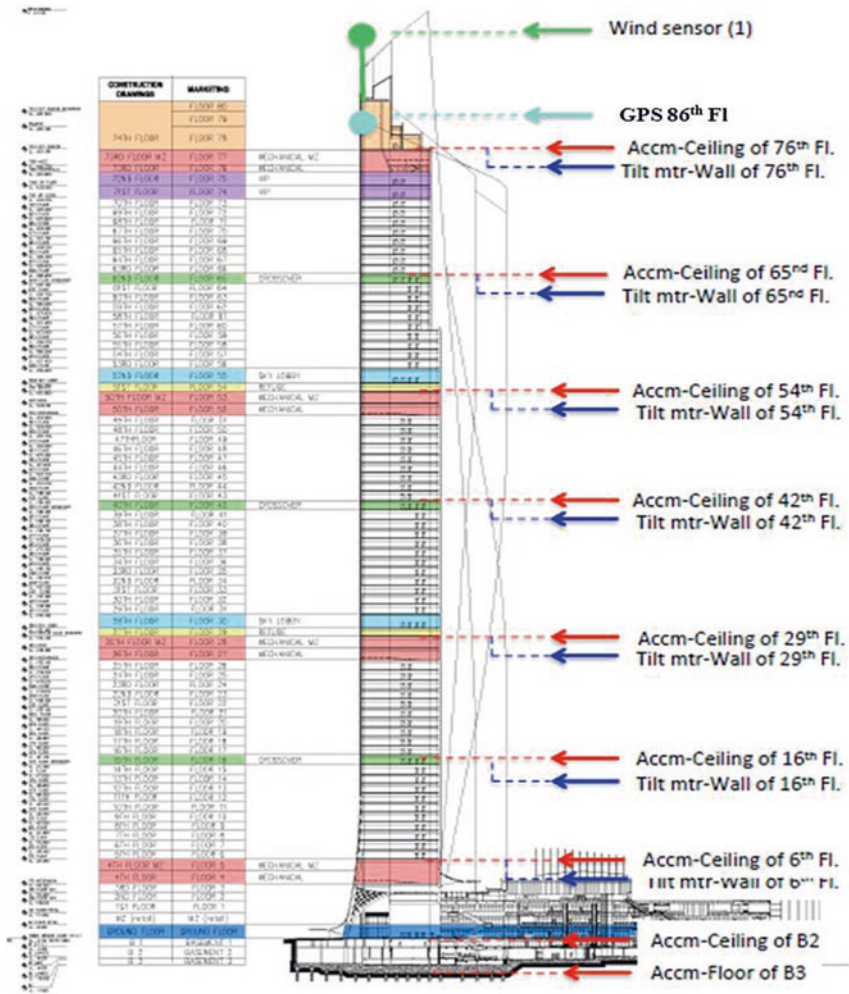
Proposed instrumented floors for the Al-Hamra tower
